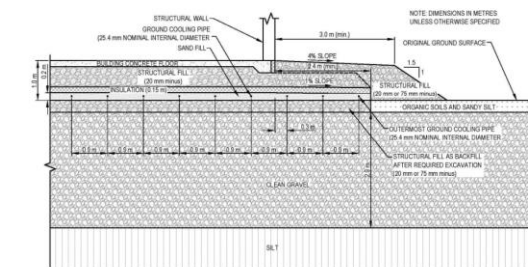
Recommended typical design section for a heat pumping chilled building foundation
